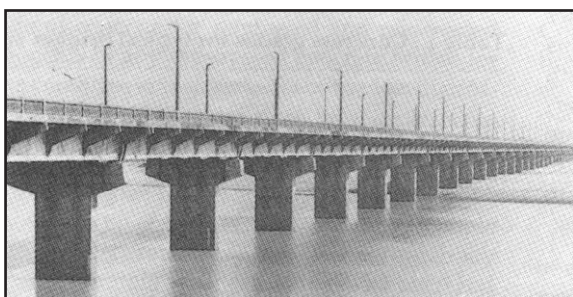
Sone bridge at Dehri-on-Sone: when completed, it was one of the longest road bridges in Asia.
